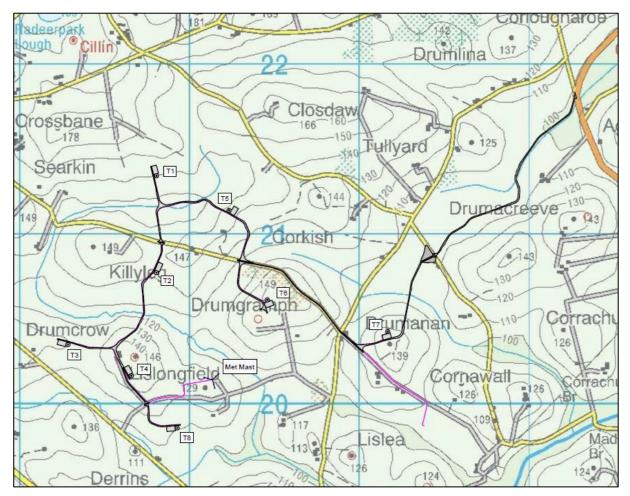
Proposed Wind Farm Site Layout (see also Annex 3.2)
